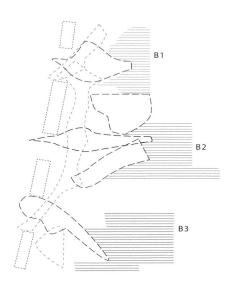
, Philippe Coignet, *Sandy Hook House*, ground plan, 2000. Coignet derived the design of the project from a house in New York City (architect unknown). He redesigned parts of it in relation to the proposed site and garden.
